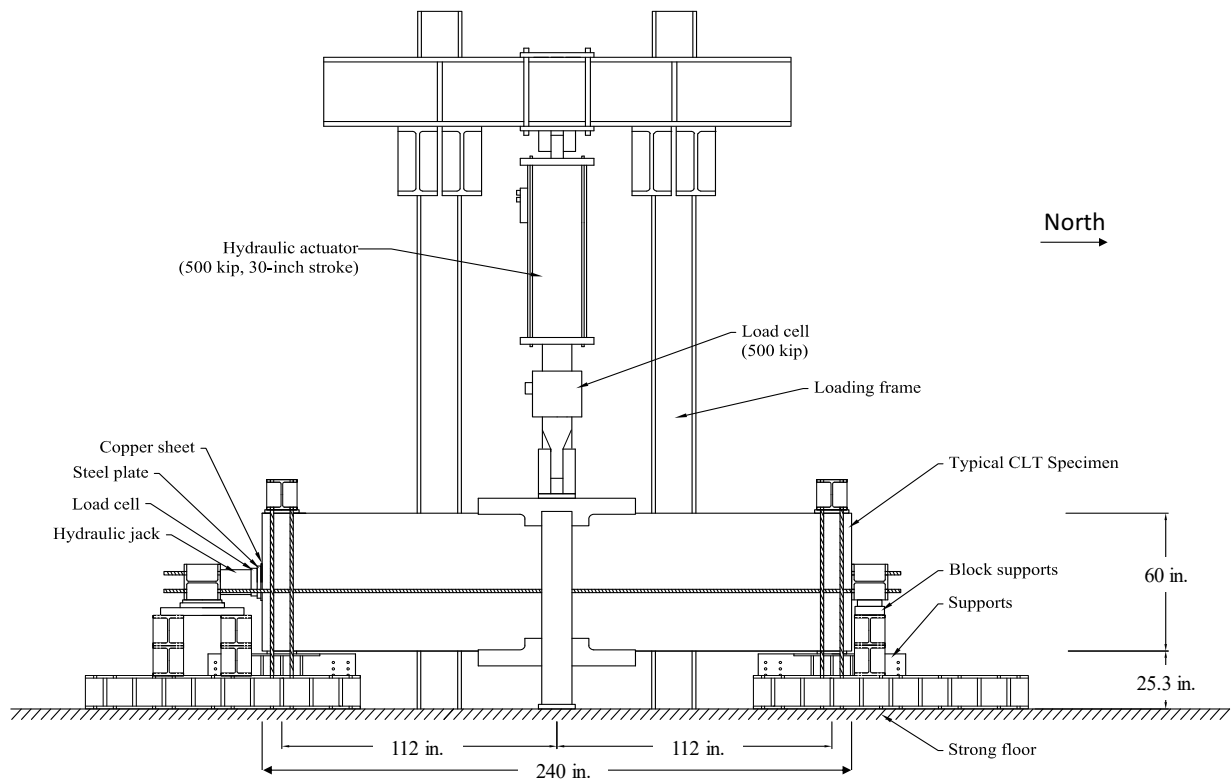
Schematic elevation view of test setup with typical CLT9 wall specimen.
